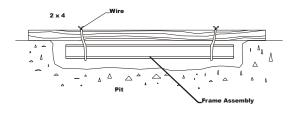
EXCAVATED PIT AND SUPPORT FOR THE PIT FRAME
